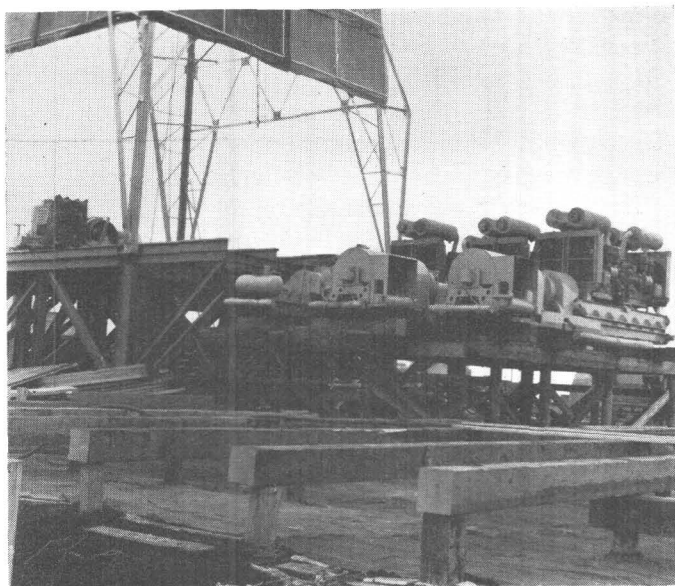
Rig foundation at Oumalik test well 1 on 30 May 1949 showing draw works, power units, and ground insulation. Photograph by U. S. Navy.
